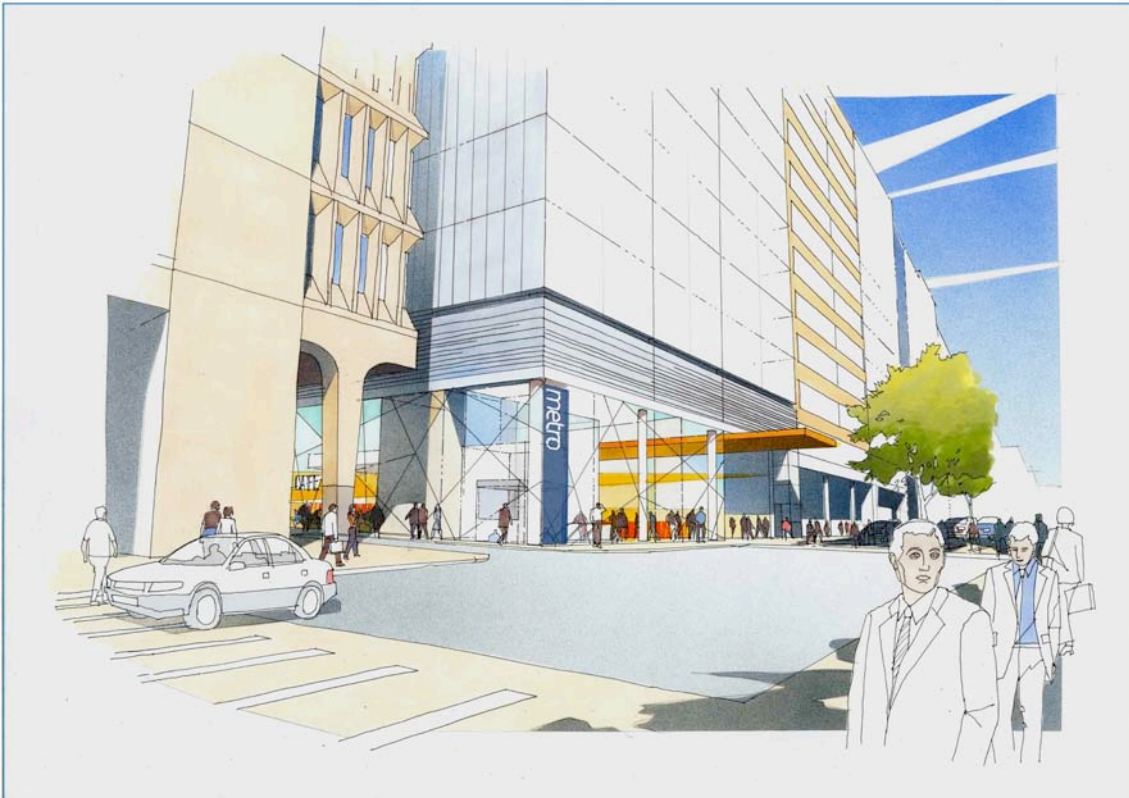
Artist's impression of the entrance to Barangaroo-Wynyard Station on Clarence Street
